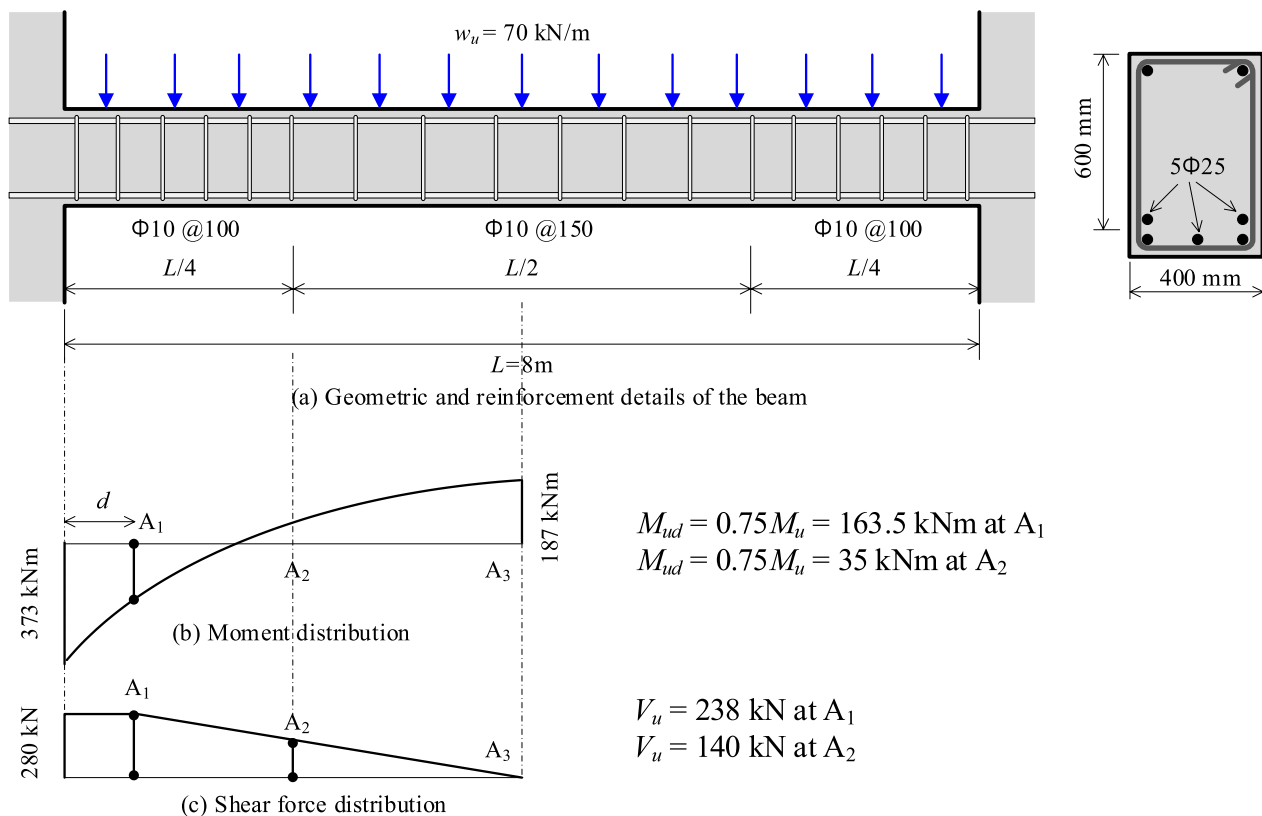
Shear design example for FRP-RC beam using the KDS 14 draft model
